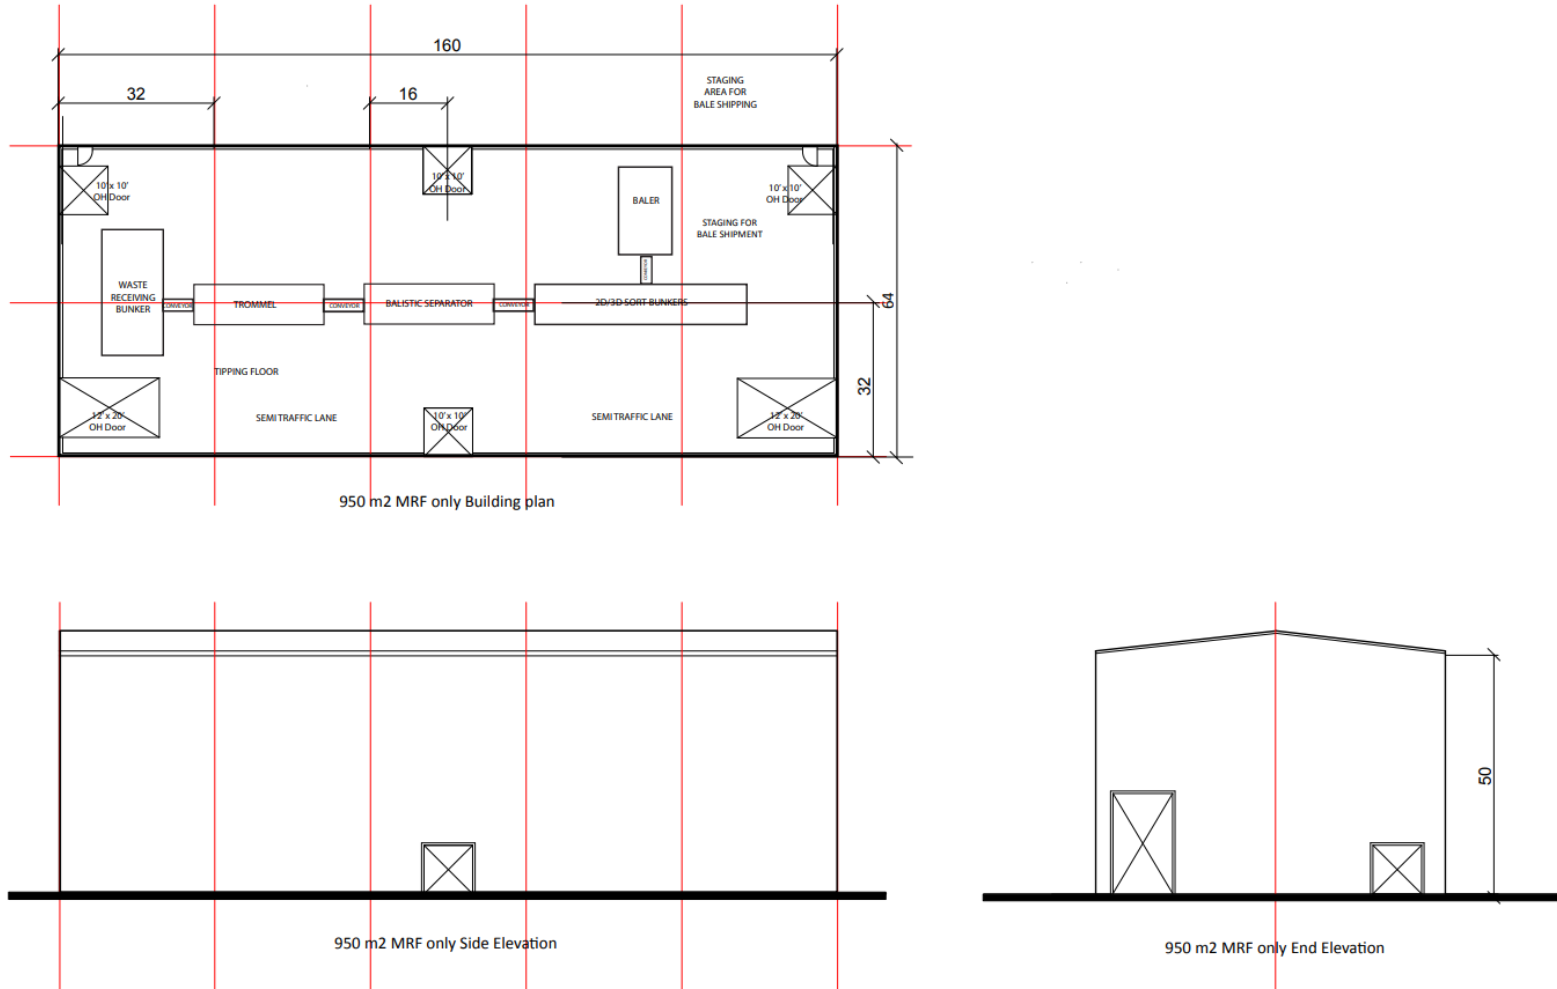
Preliminary Drawing - Plan and Elevations for 950 m2 Building
